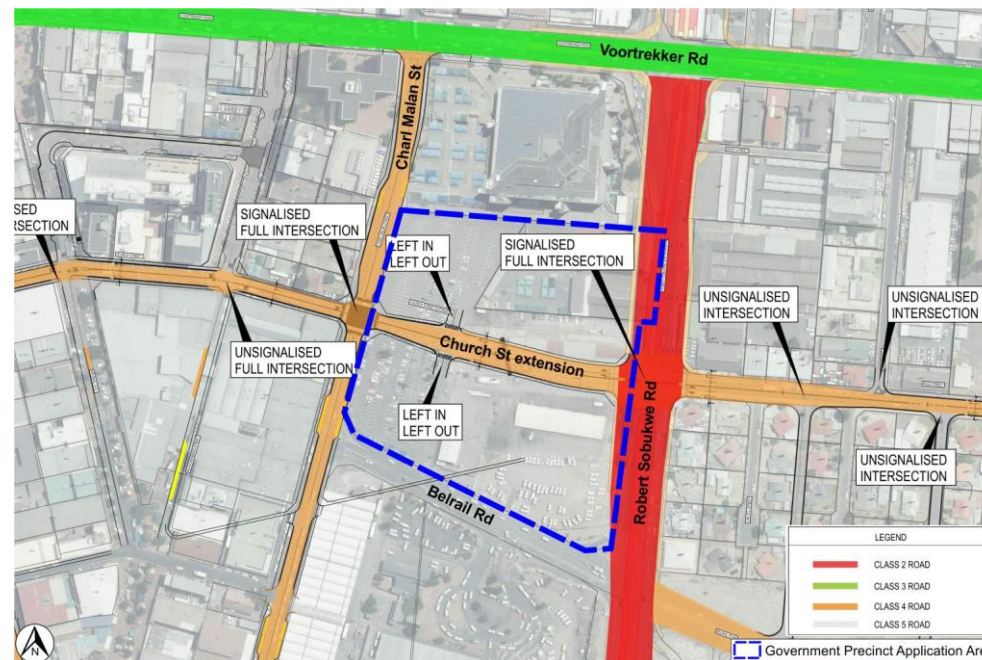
Robert Sobukwe Road and new Church Street (Zutari, June 2022)
